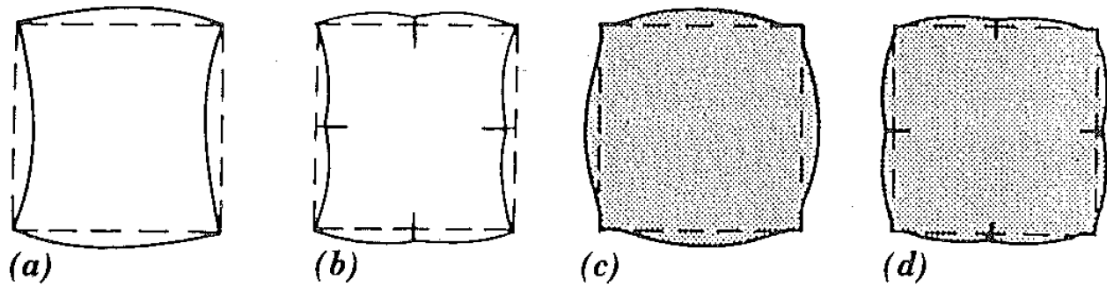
Failure modes of cross-sections: (a) steel column; (b) stiffened steel column;
